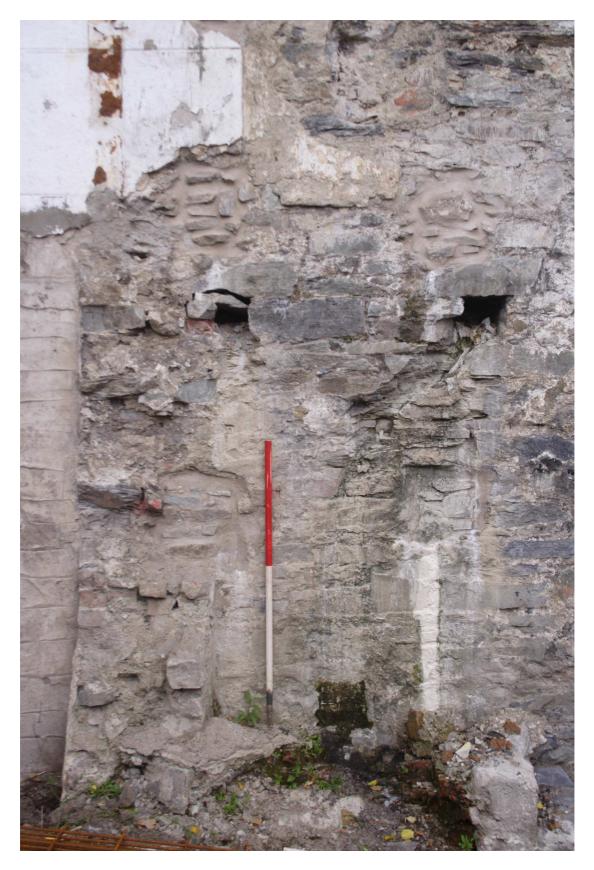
Lower section of retaining wall showing damaged putlogs. Former cottage wall to left of centre. Concrete render visible in upper left, shot 9.
